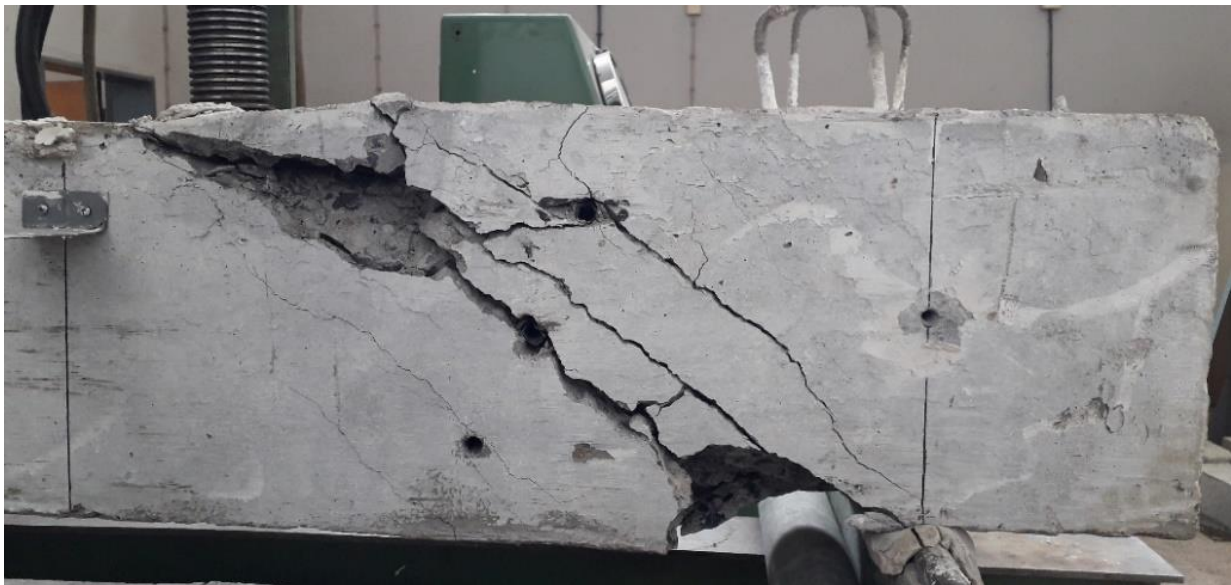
Diagonal Compression Crack and Top Spalling at Failure Front Side (SII10-50)
